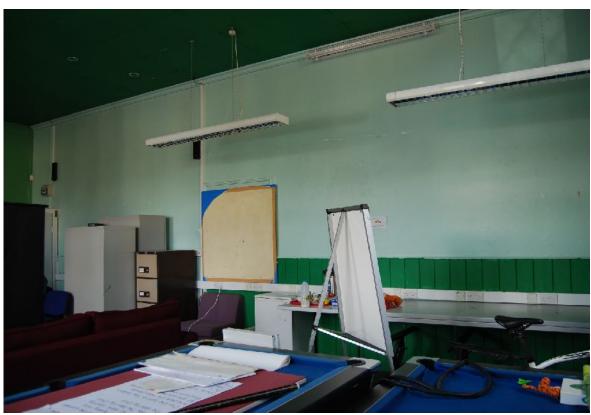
West elevation of north room with blocked doorway behind notice board (from NE)
